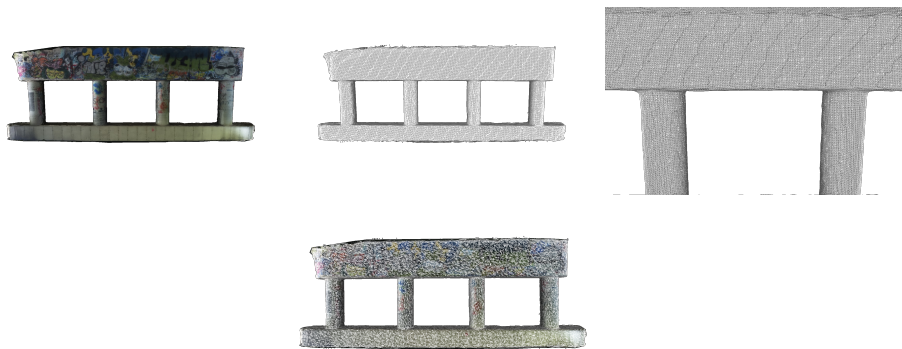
FEM from Plain Street bridge, Lowell MA. column section
